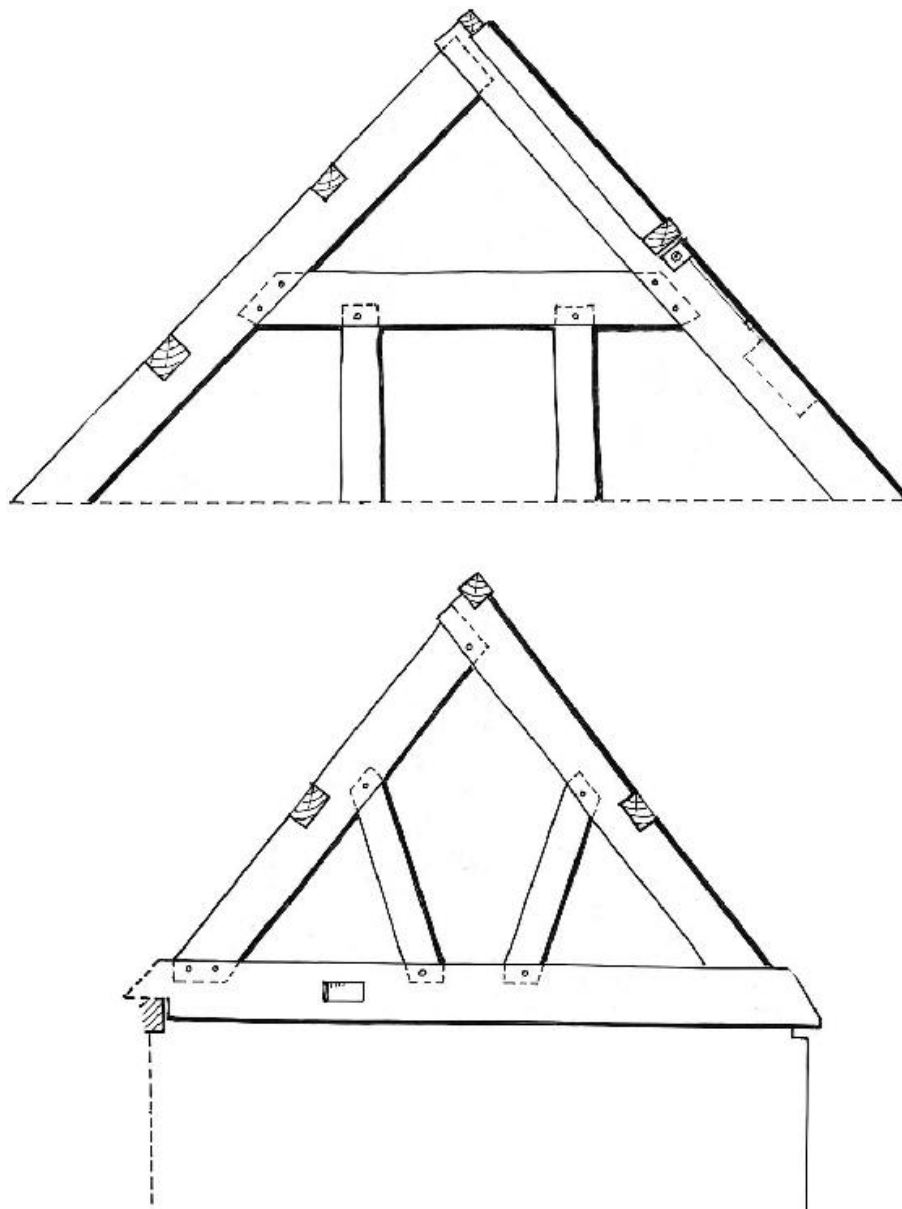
South gable (top) and intermediate roof trusses in 7 St Peter's Street
